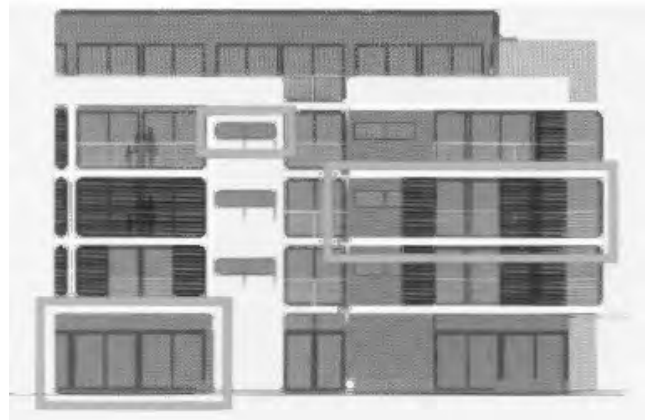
7 Façade with horizontal elements, large window openings for views, deep balconies and awnings for sun protection and lightweight materials
